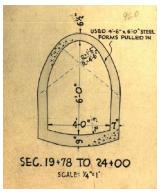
Semi-elliptical shaped storm drain tunnel. Segment 2-TUN-5, constructed 1939-1940.
